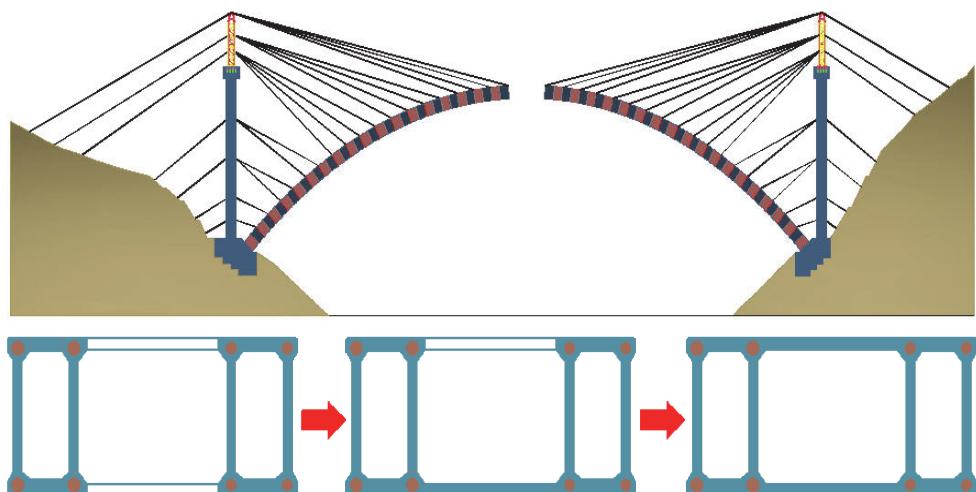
Schematic diagram of cable-stayed cantilever erection method
